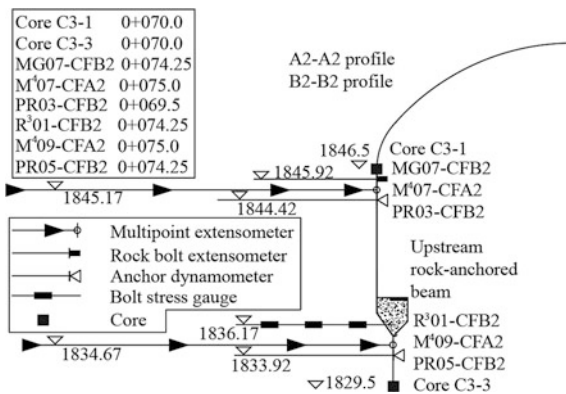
Layout of monitoring instruments on the upstream sidewall of main powerhouse
